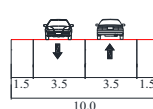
Typical cross section of New city Road (Tertiary: Urban / Rural Area)
